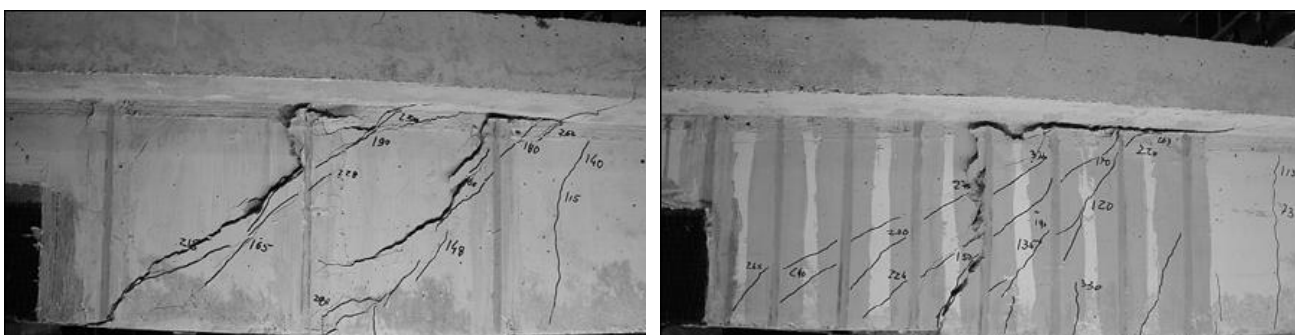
Laminates inclined at 90°: a) debonding (beam 2S_3LV); b) concrete tensile failure (beam 2S_8LV)
